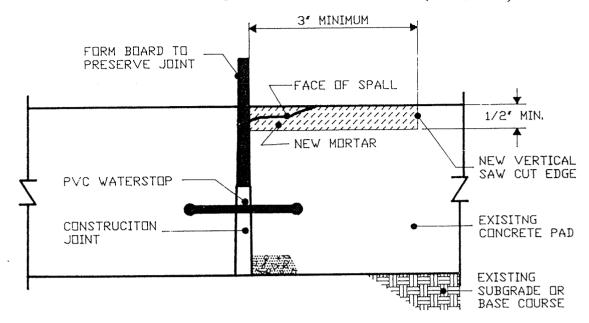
Repair of a Spall on a Construction Joint (Keen, 1991).
